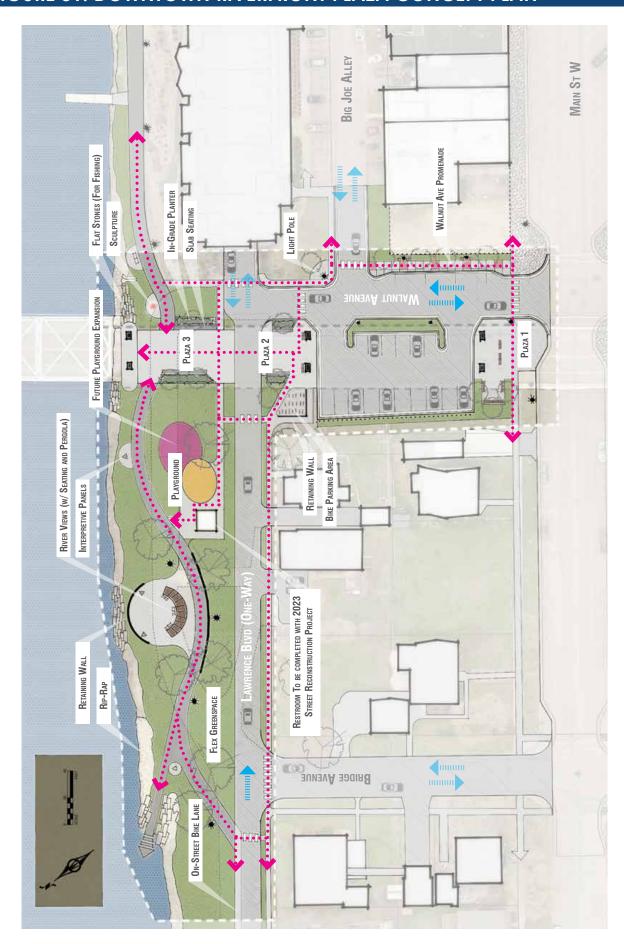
DOWNTOWN RIVERFRONT PLAZA CONCEPT PLAN
